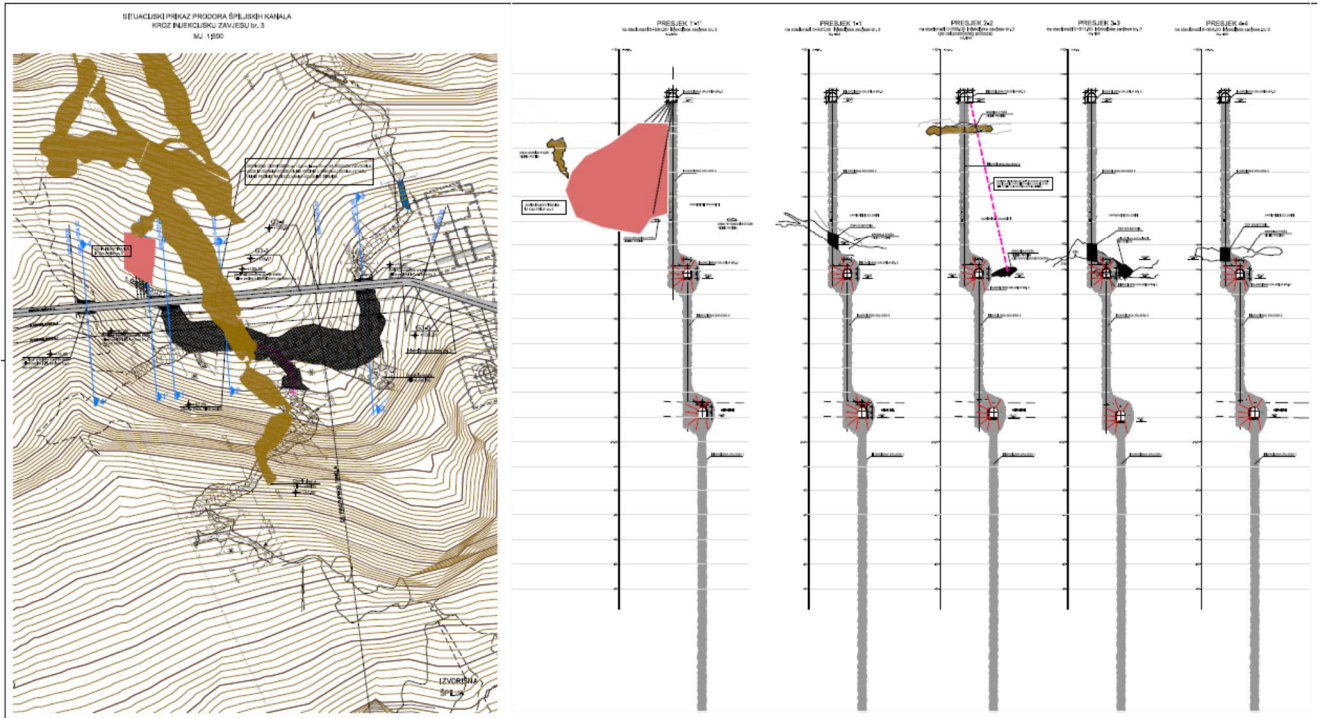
Proposed Method of Sealing Potential Conduit and Fracture Connections between the Middle Level Caves System and Vilina Cave. (Source: ElektroProjekt)
